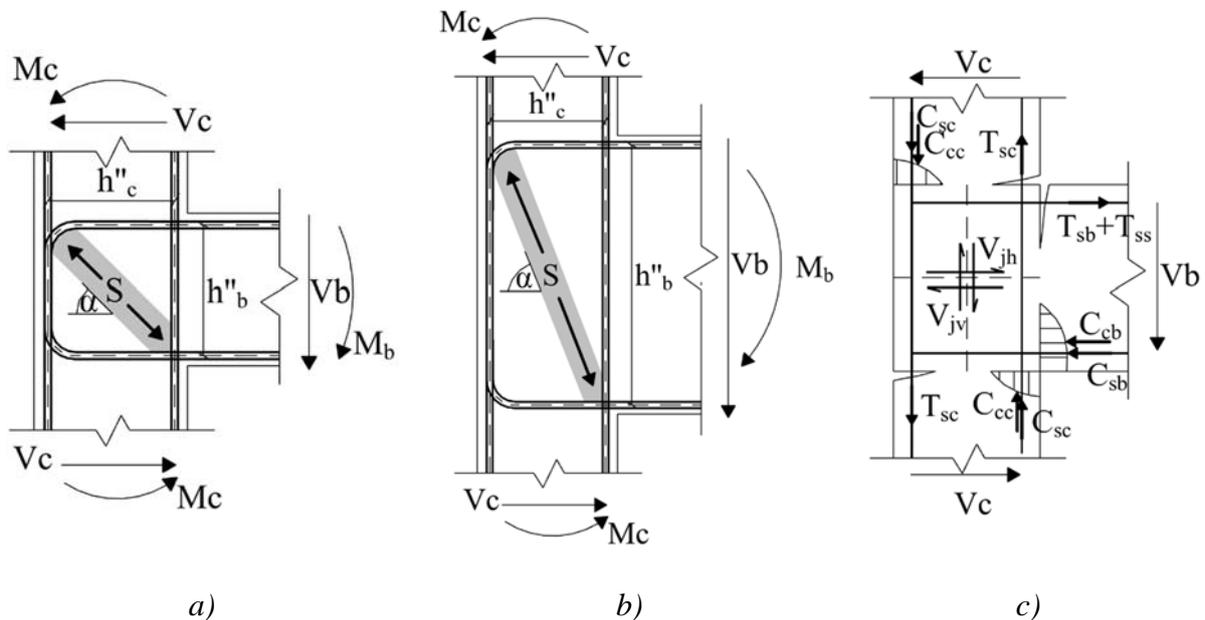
Diagonal strut formation for a) alpha = 1, b) alpha = 2 and c) horizontal and vertical joint shear of an exterior beam-column joint with slab
